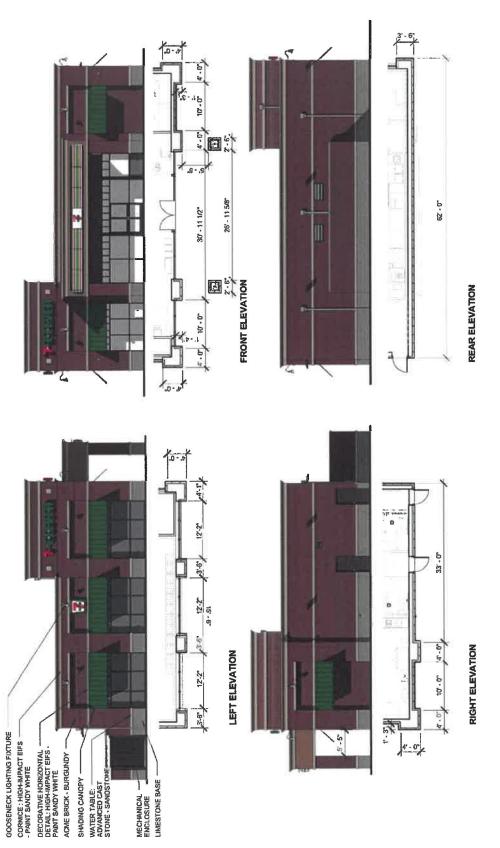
EXHIBIT 'G':Concept Plan and Elevations from Ordinance No. 12-13
